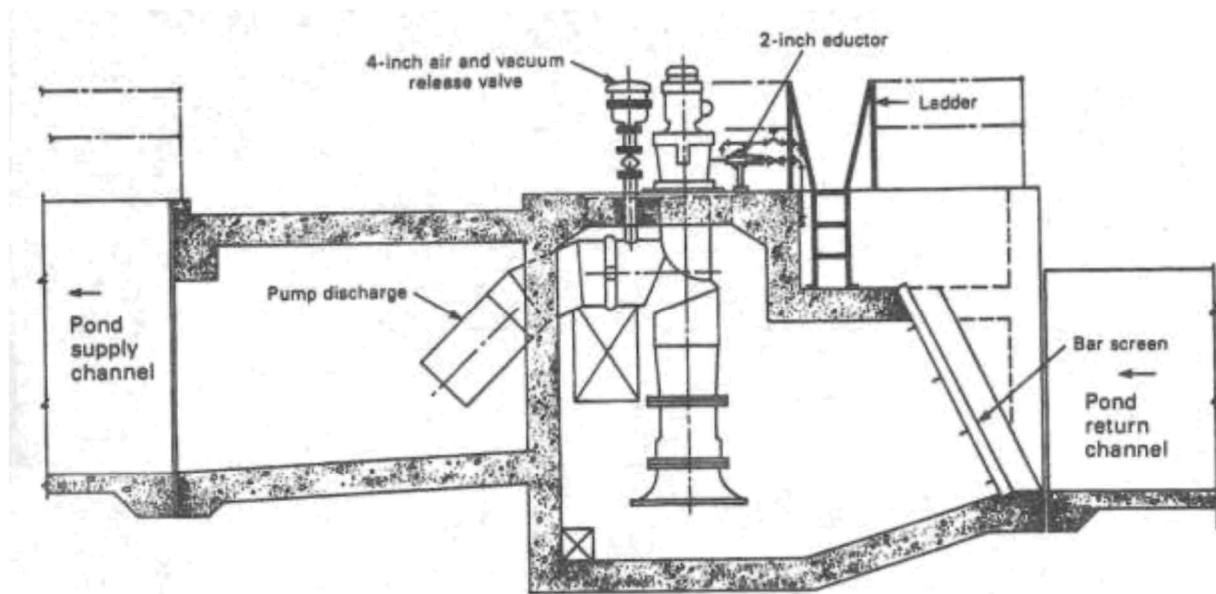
Cross-sectional view of a typical recirculation pumping station.
